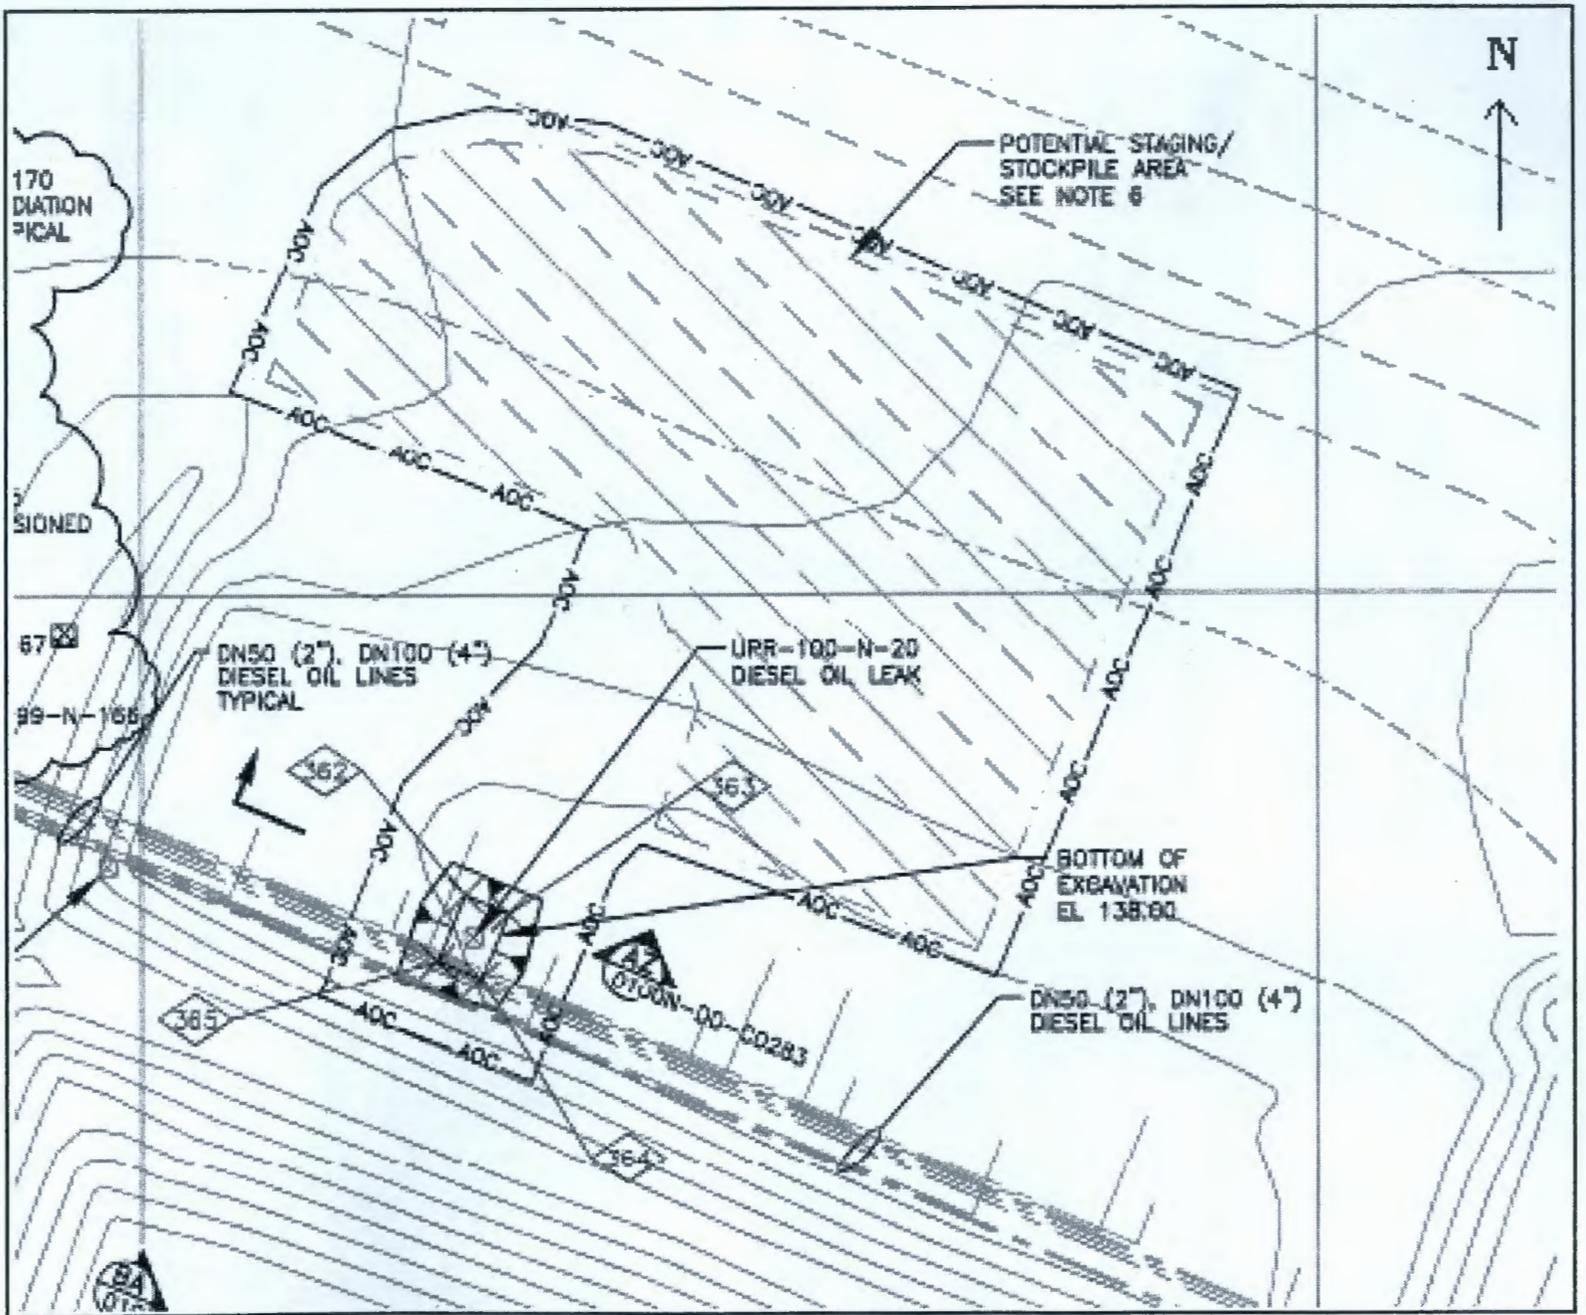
UPR-100-N-20 Waste Site Excavation Civil Plot (drawing: 0100N-DD-C0254)
